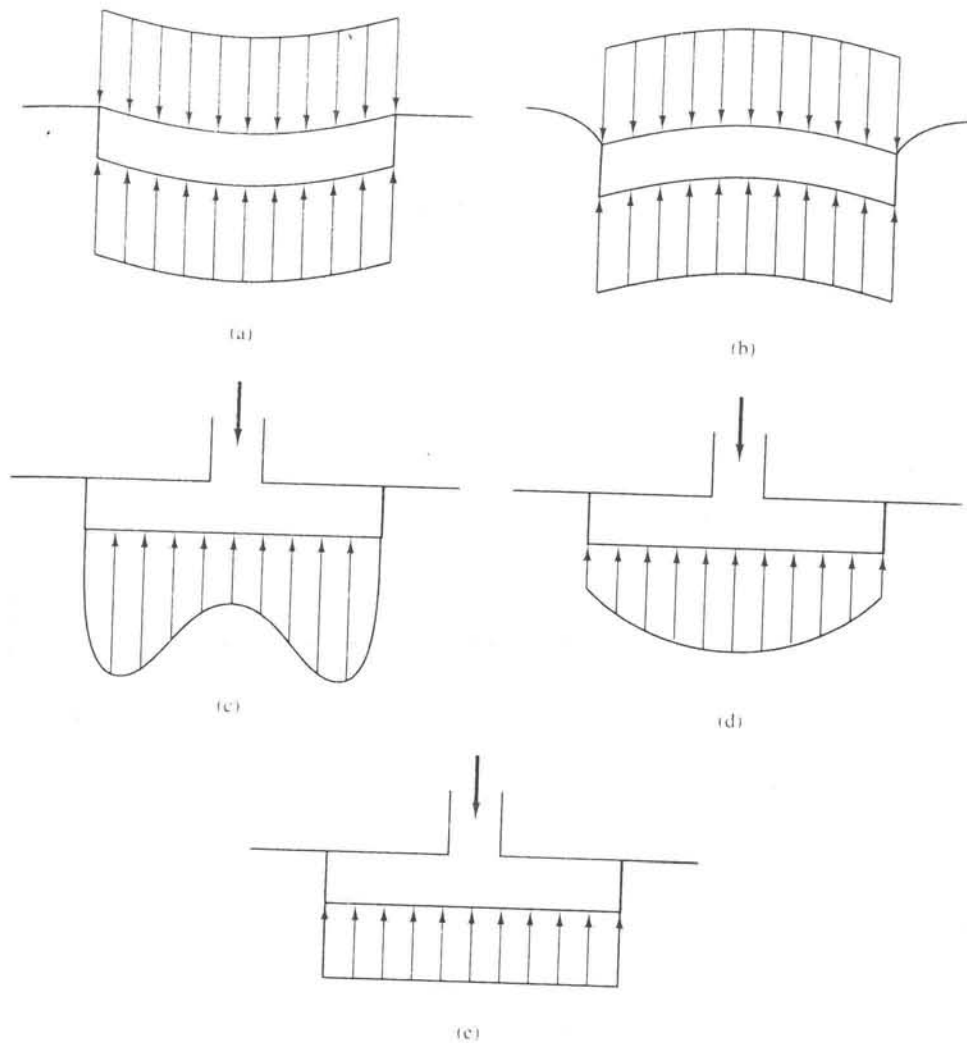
Distribution of bearing pressure along the base of shallow foundations subjected to concentric vertical loads: (a) flexible foundation on clay, (b) flexible foundation on sand, (c) rigid foundation on clay, (d) rigid foundation on sand, and (e) simplified distribution (after Taylor, 1948).
